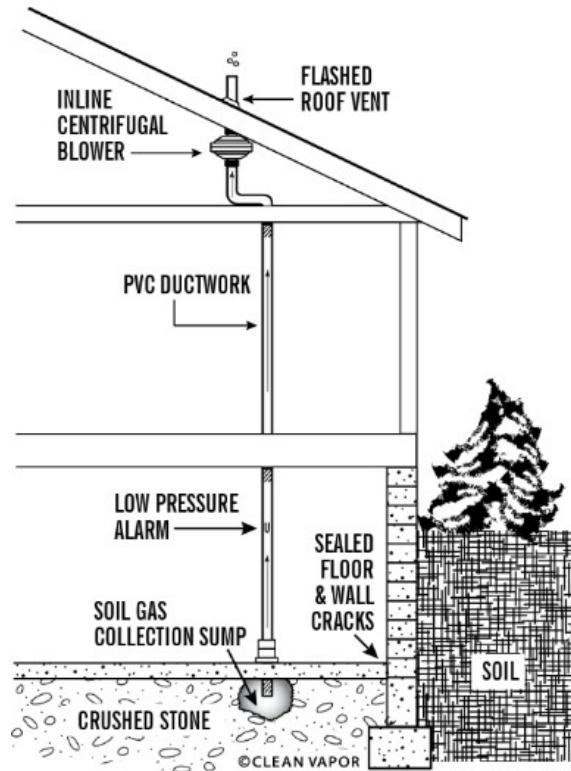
Example sub-slab depressurization system (fan in the attic, outside living building envelope).
